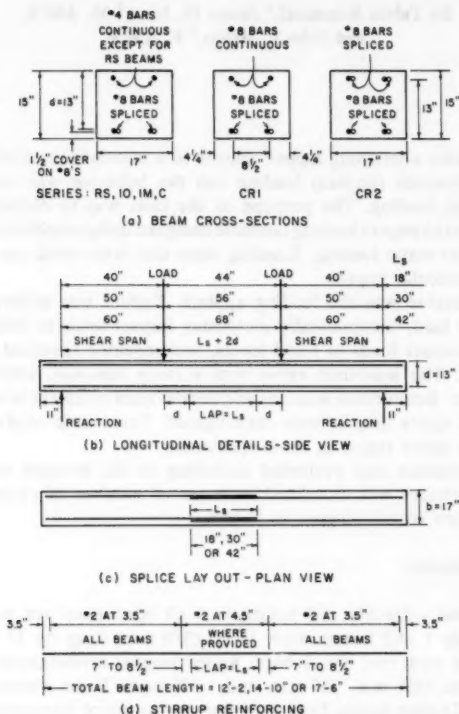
Specimen Details (1 in. = 25.4 mm)
